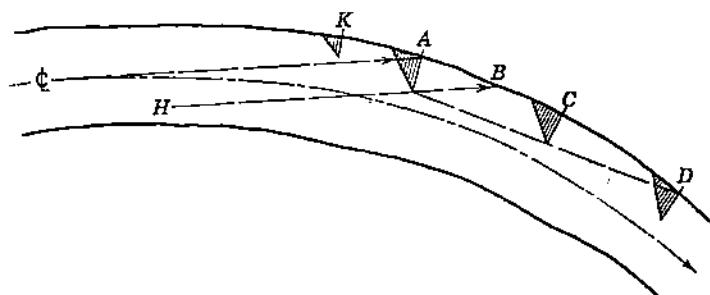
Design and location of retard. (Redrawn from Saveson and Overholt.¹²)
